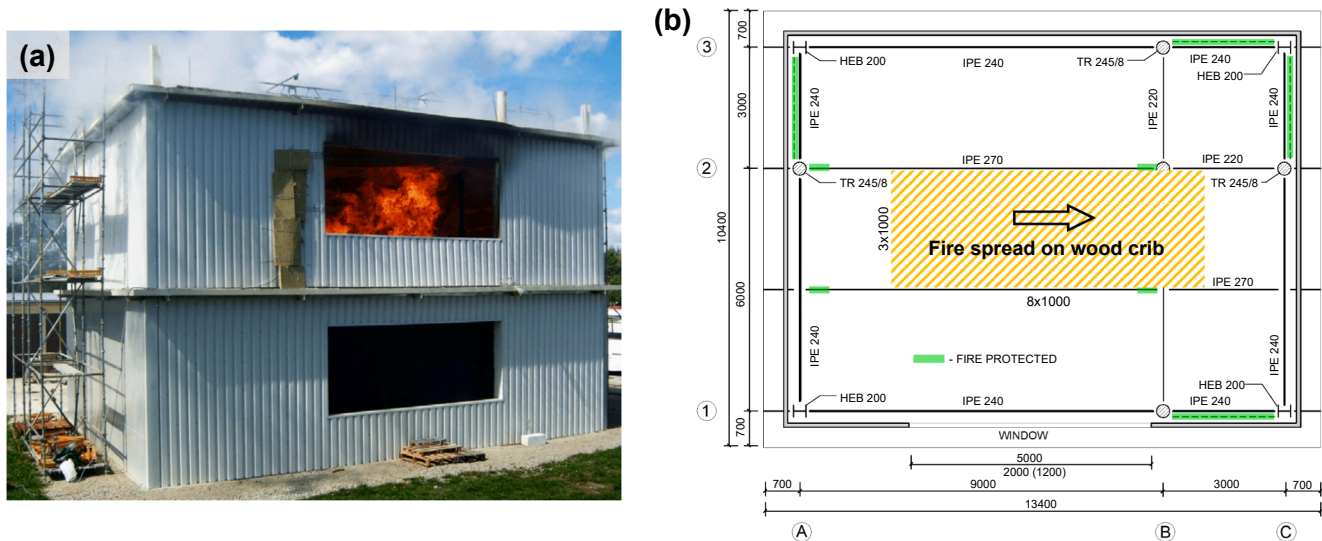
(a). Photo of the fire progression during the Veselý Travelling Fire Test on the upper floor; and (b). Plan view of upper floor structural layout and wood crib distribution (unit in mm). (both figures adapted from Horová et al. [26]).
